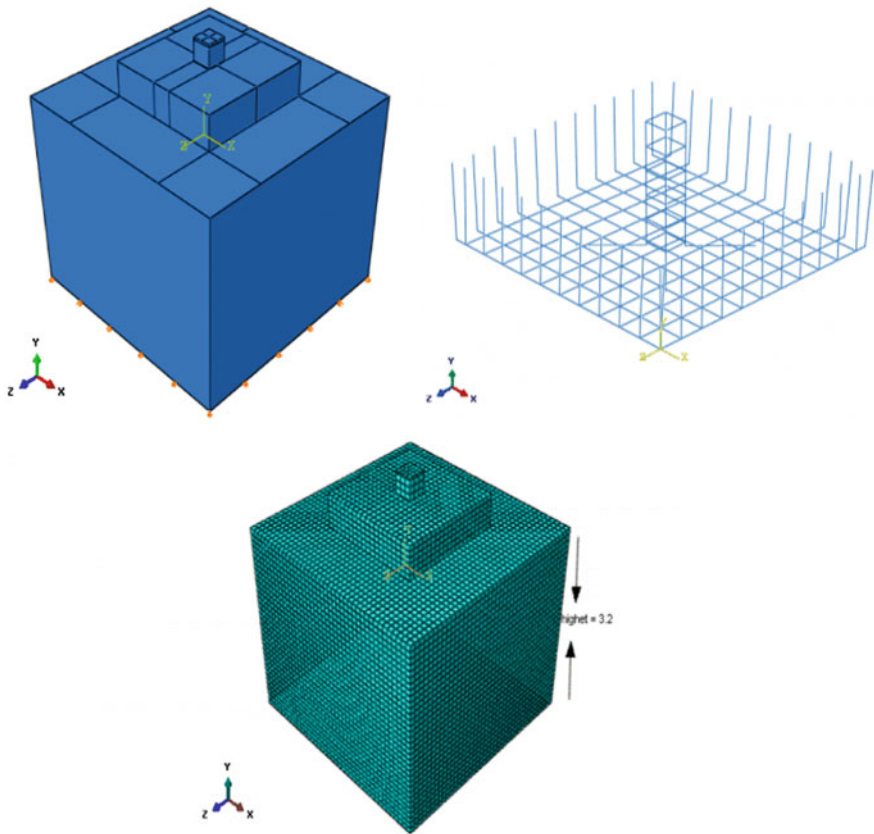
Typical finite element model of concrete footing in reinforcement detail and mesh
